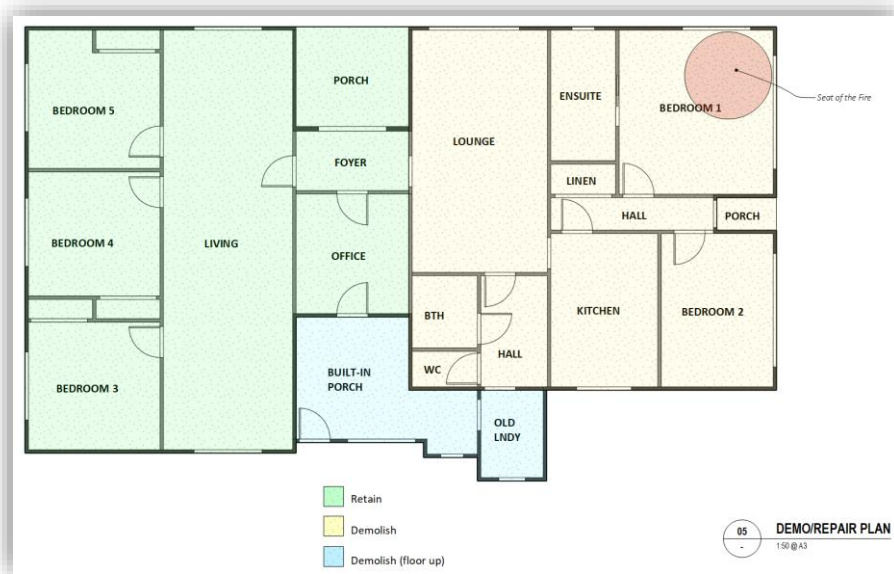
; Copy of the Overstone Demo/Repair Plan showing the separate building elements (yellow = original footprint; green = Western extension; blue = built-in porch).
